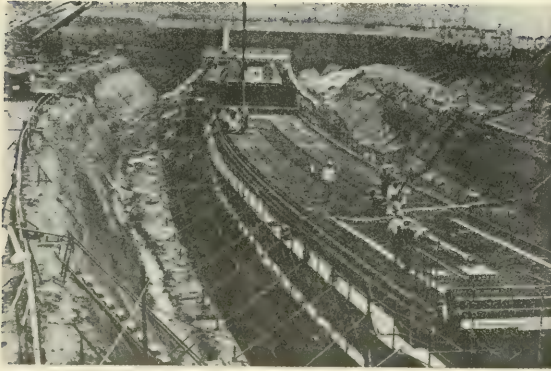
The accelerator tunnel at the north area looking at the straight section and in the background an external wall of the Tsukuba hall. (April 1984)
